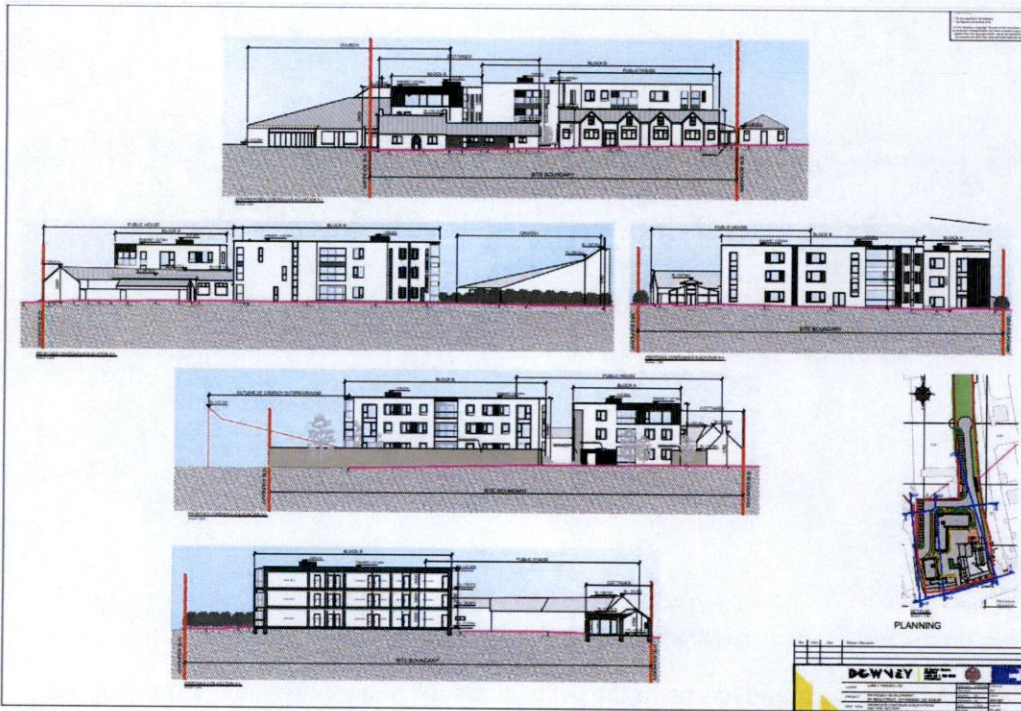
Extract of initial proposed development contiguous elevations of apartment blocks
